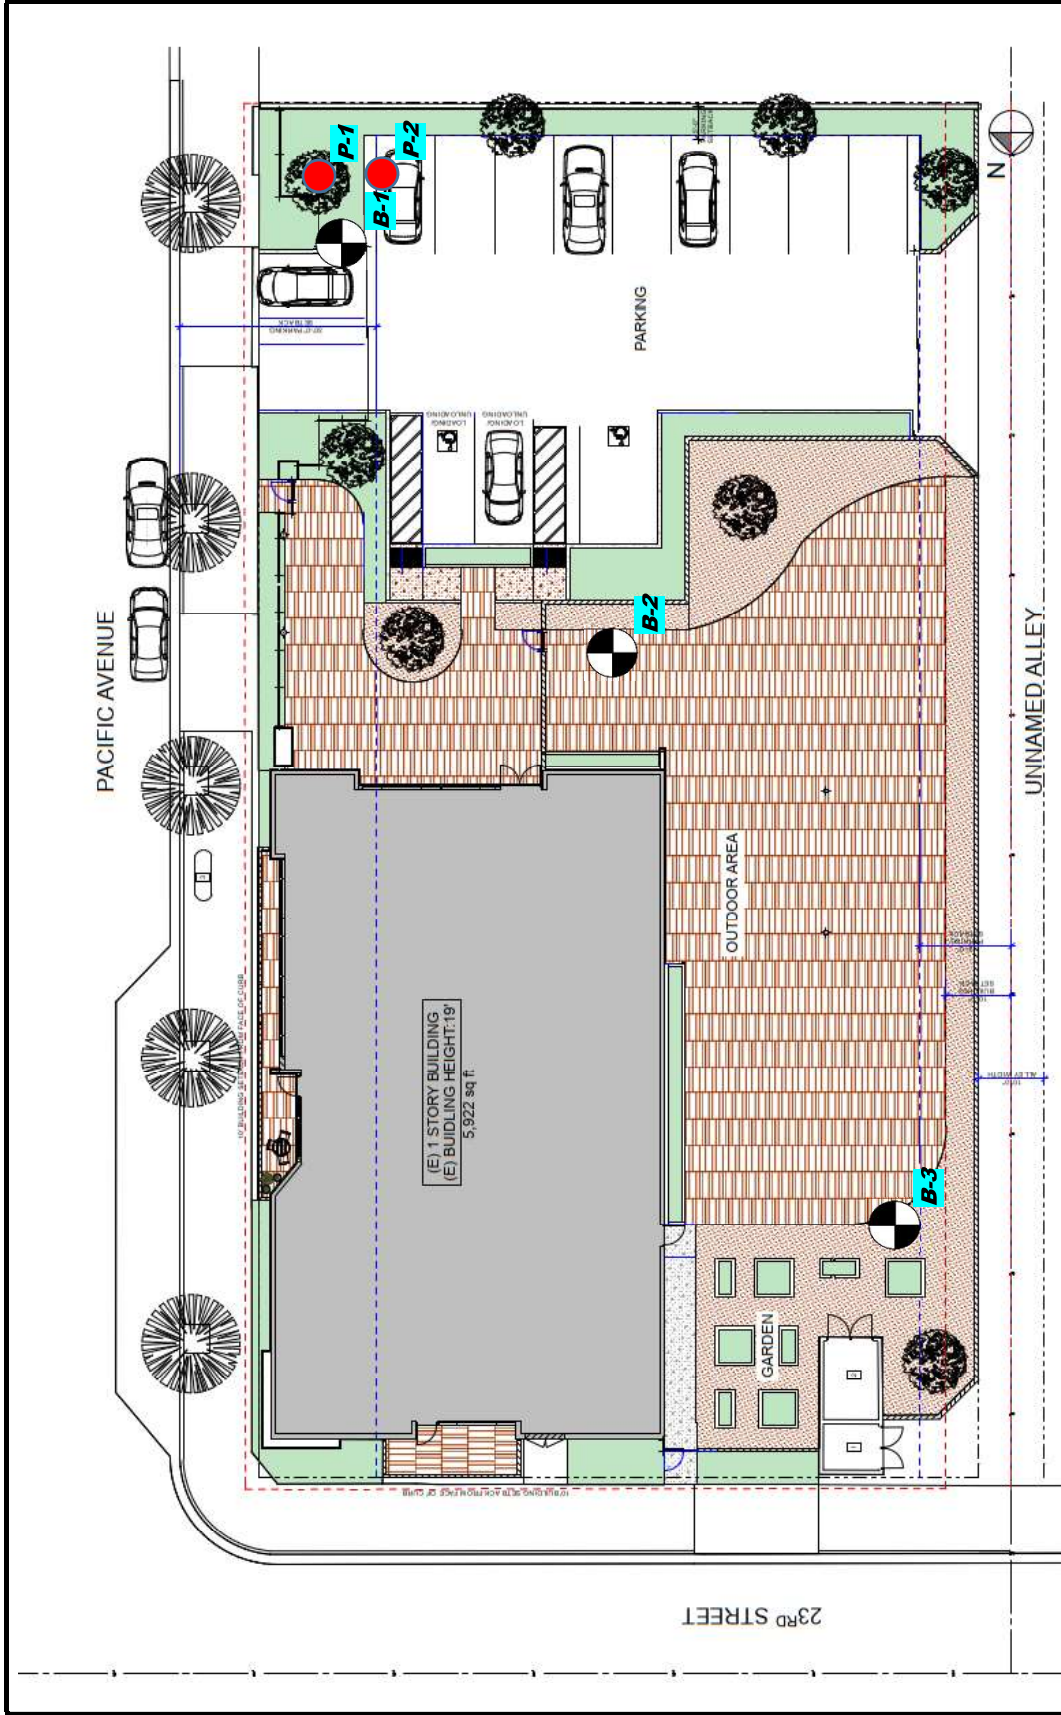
EXPLORATION PLAN (AERIAL)
